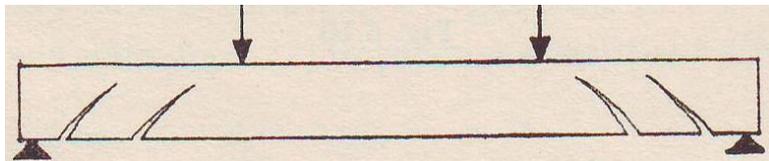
Cracks in concrete beams due to diagonal tension.
